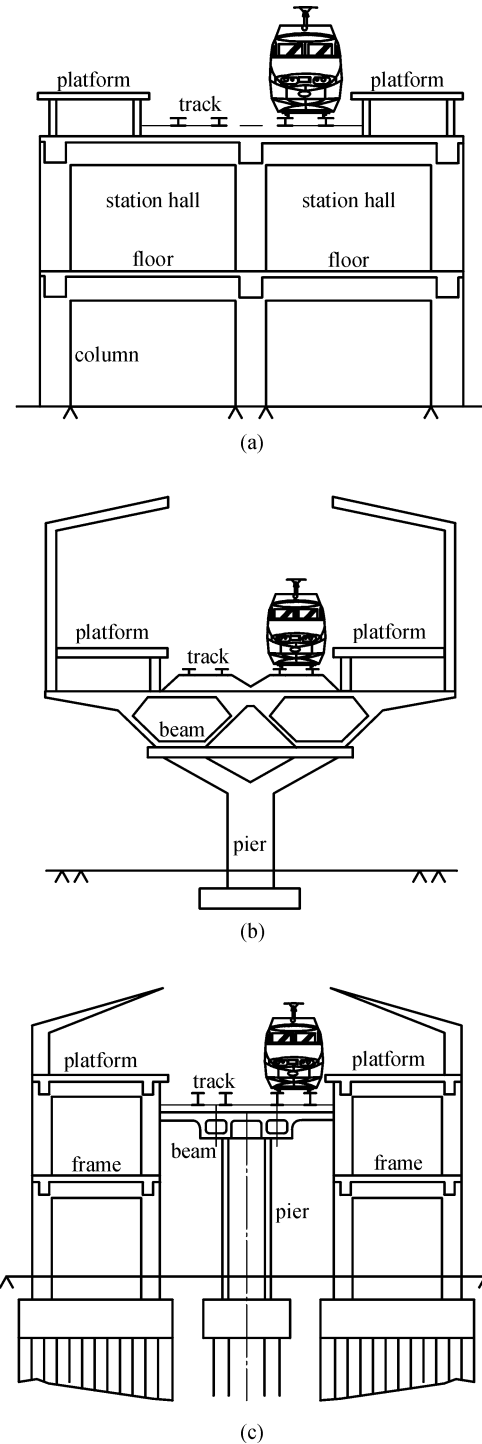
Structure types of elevated railway stations. (a) Frame system; (b) bridge; (c) frame-bridge combined system
